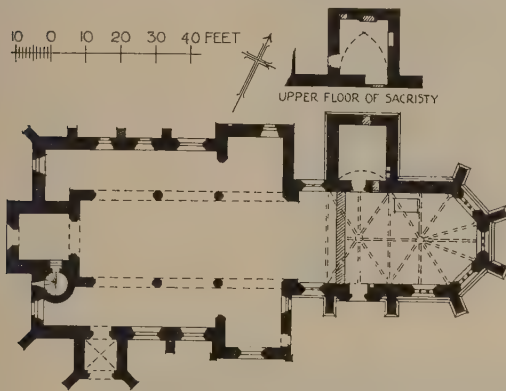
West Parish Church, Dalkeith (No. 75).
